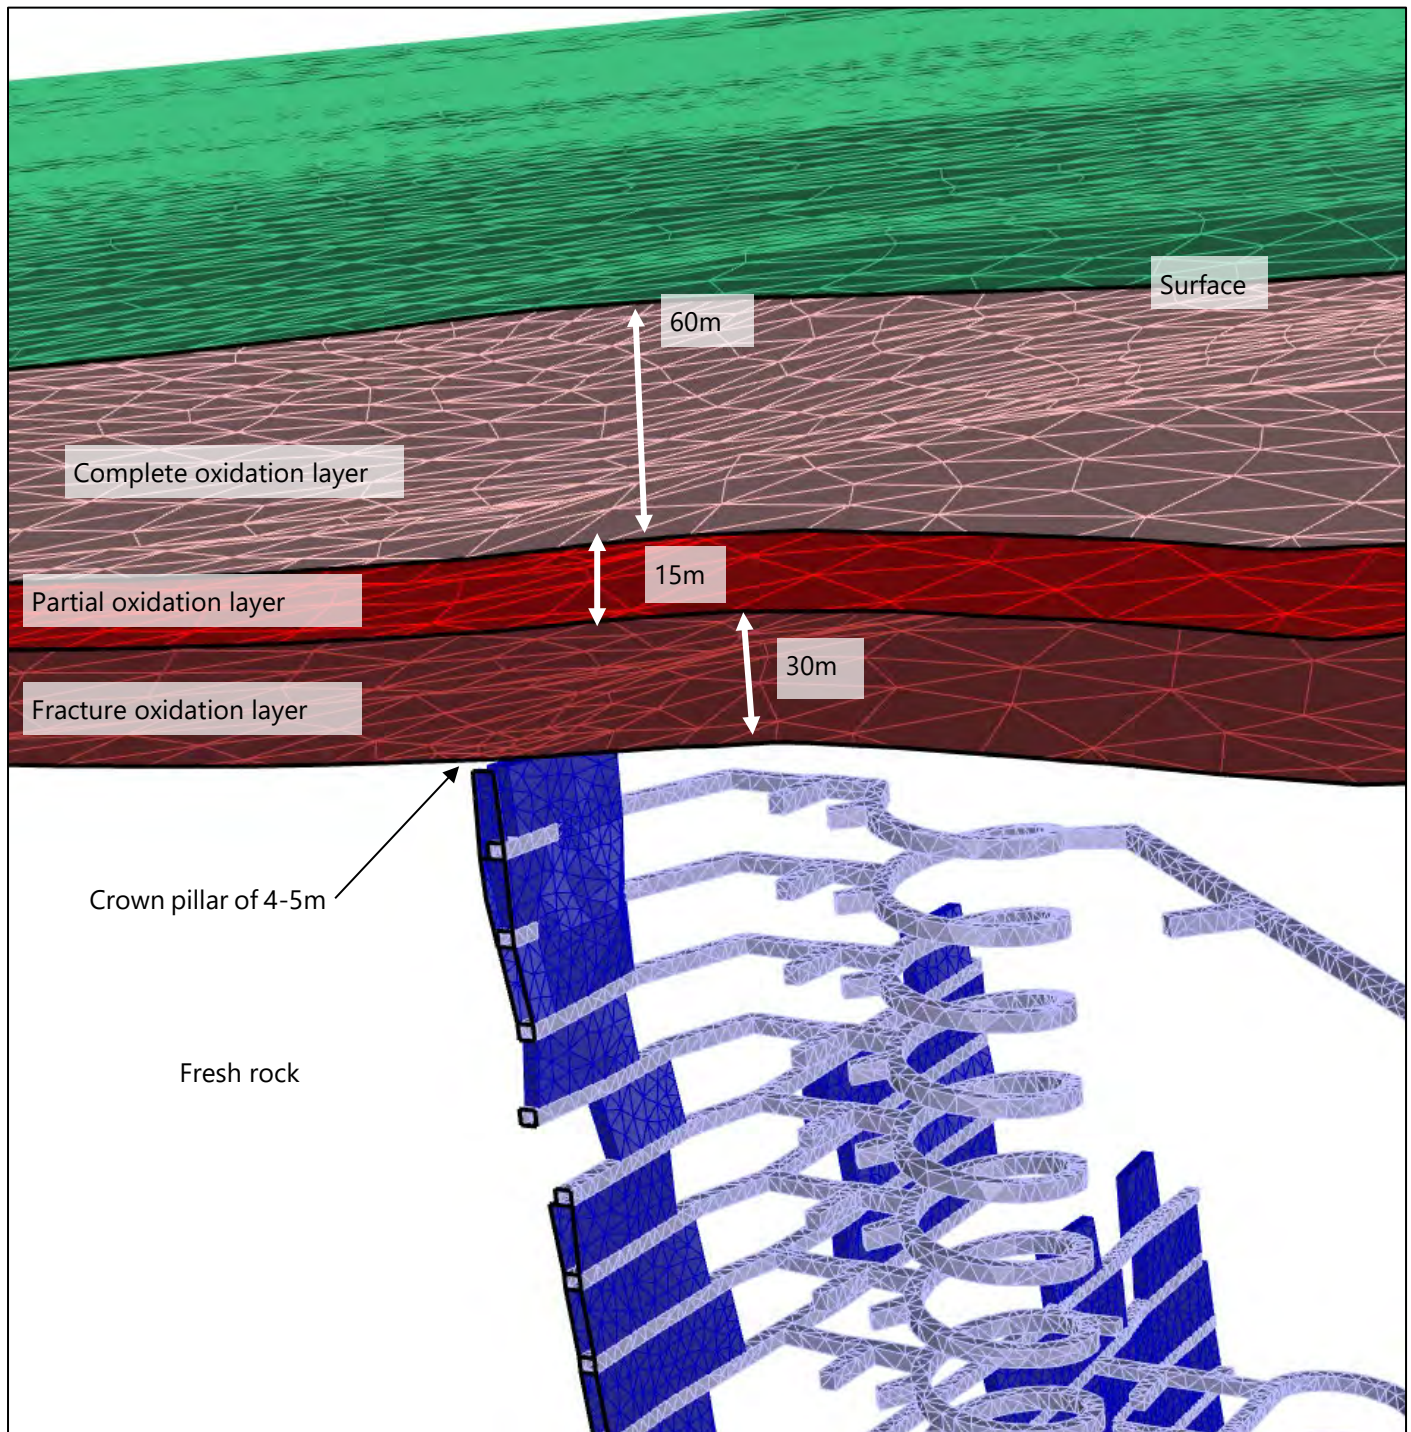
Cross section through the Gladstone mine showing planned stopes in proximity the oxidized layers (facing North West)
